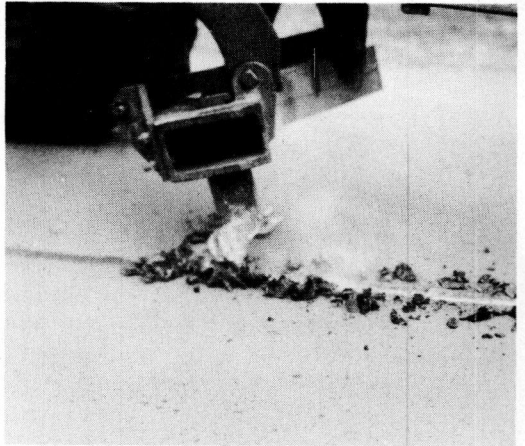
A close-up view of the cutter and depth-control shoe in action.
